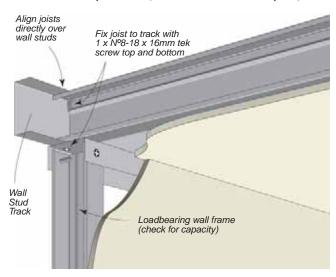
JOIST END SUPPORT MECHANICAL JOINT Maximum Joist Span: 6.0m (single span).
